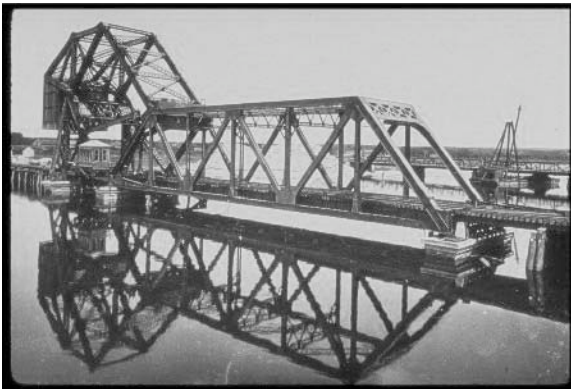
The Original Railroad Bridge over the Cape Cod Canal, 1914-1935¹
